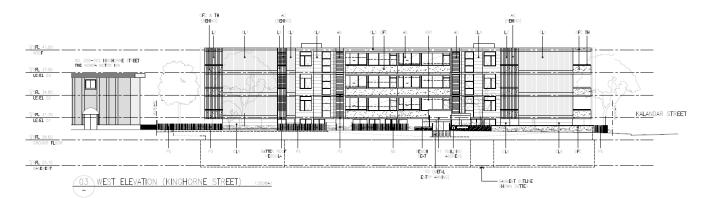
Elevation of the proposed development (western elevation - Kinghorne Street).
